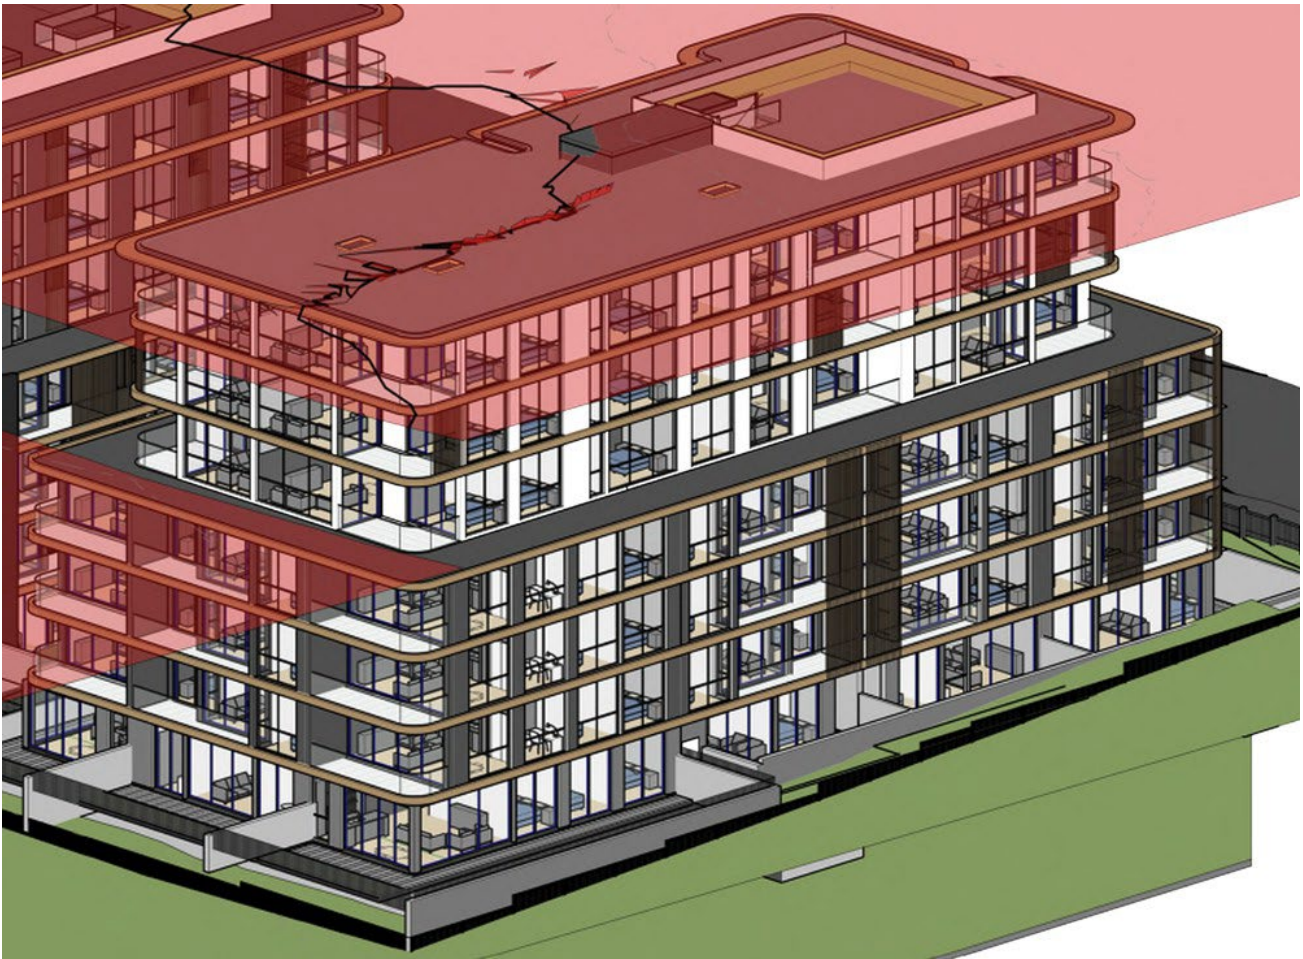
Applicant's illustration of the proposed Building A breach of the SEPP Housing building height standard relating to the lift overrun
